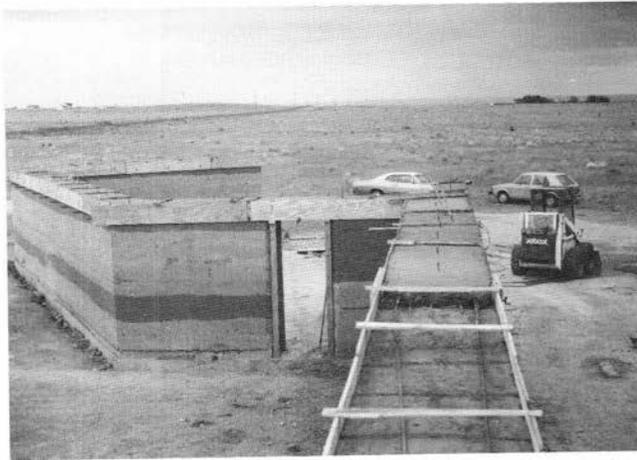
Rammed-earth walls and pouring of the concrete bond beam. Note the soil colors and the layering produced by tamping. Huston Construction Company building site, Edgewood.
